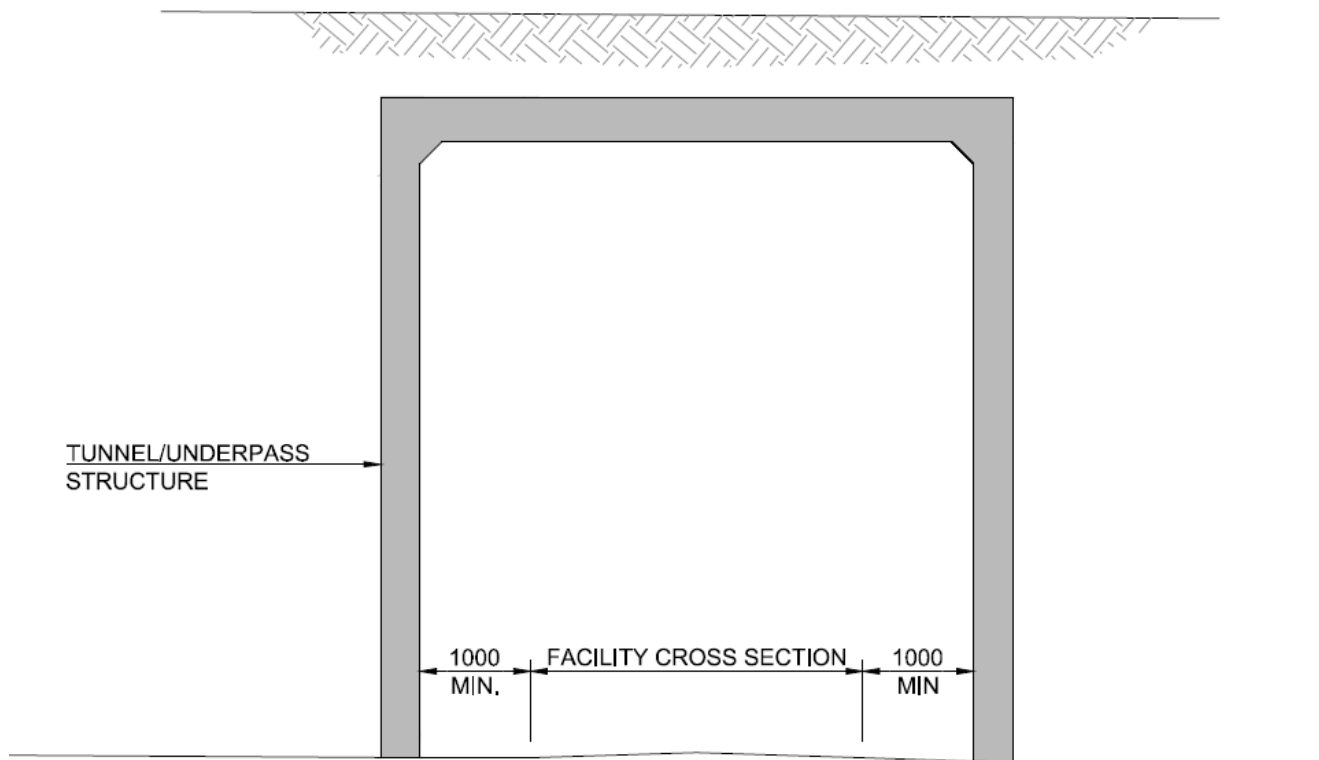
Typical Cross Section at Tunnel/Underpass Structure
